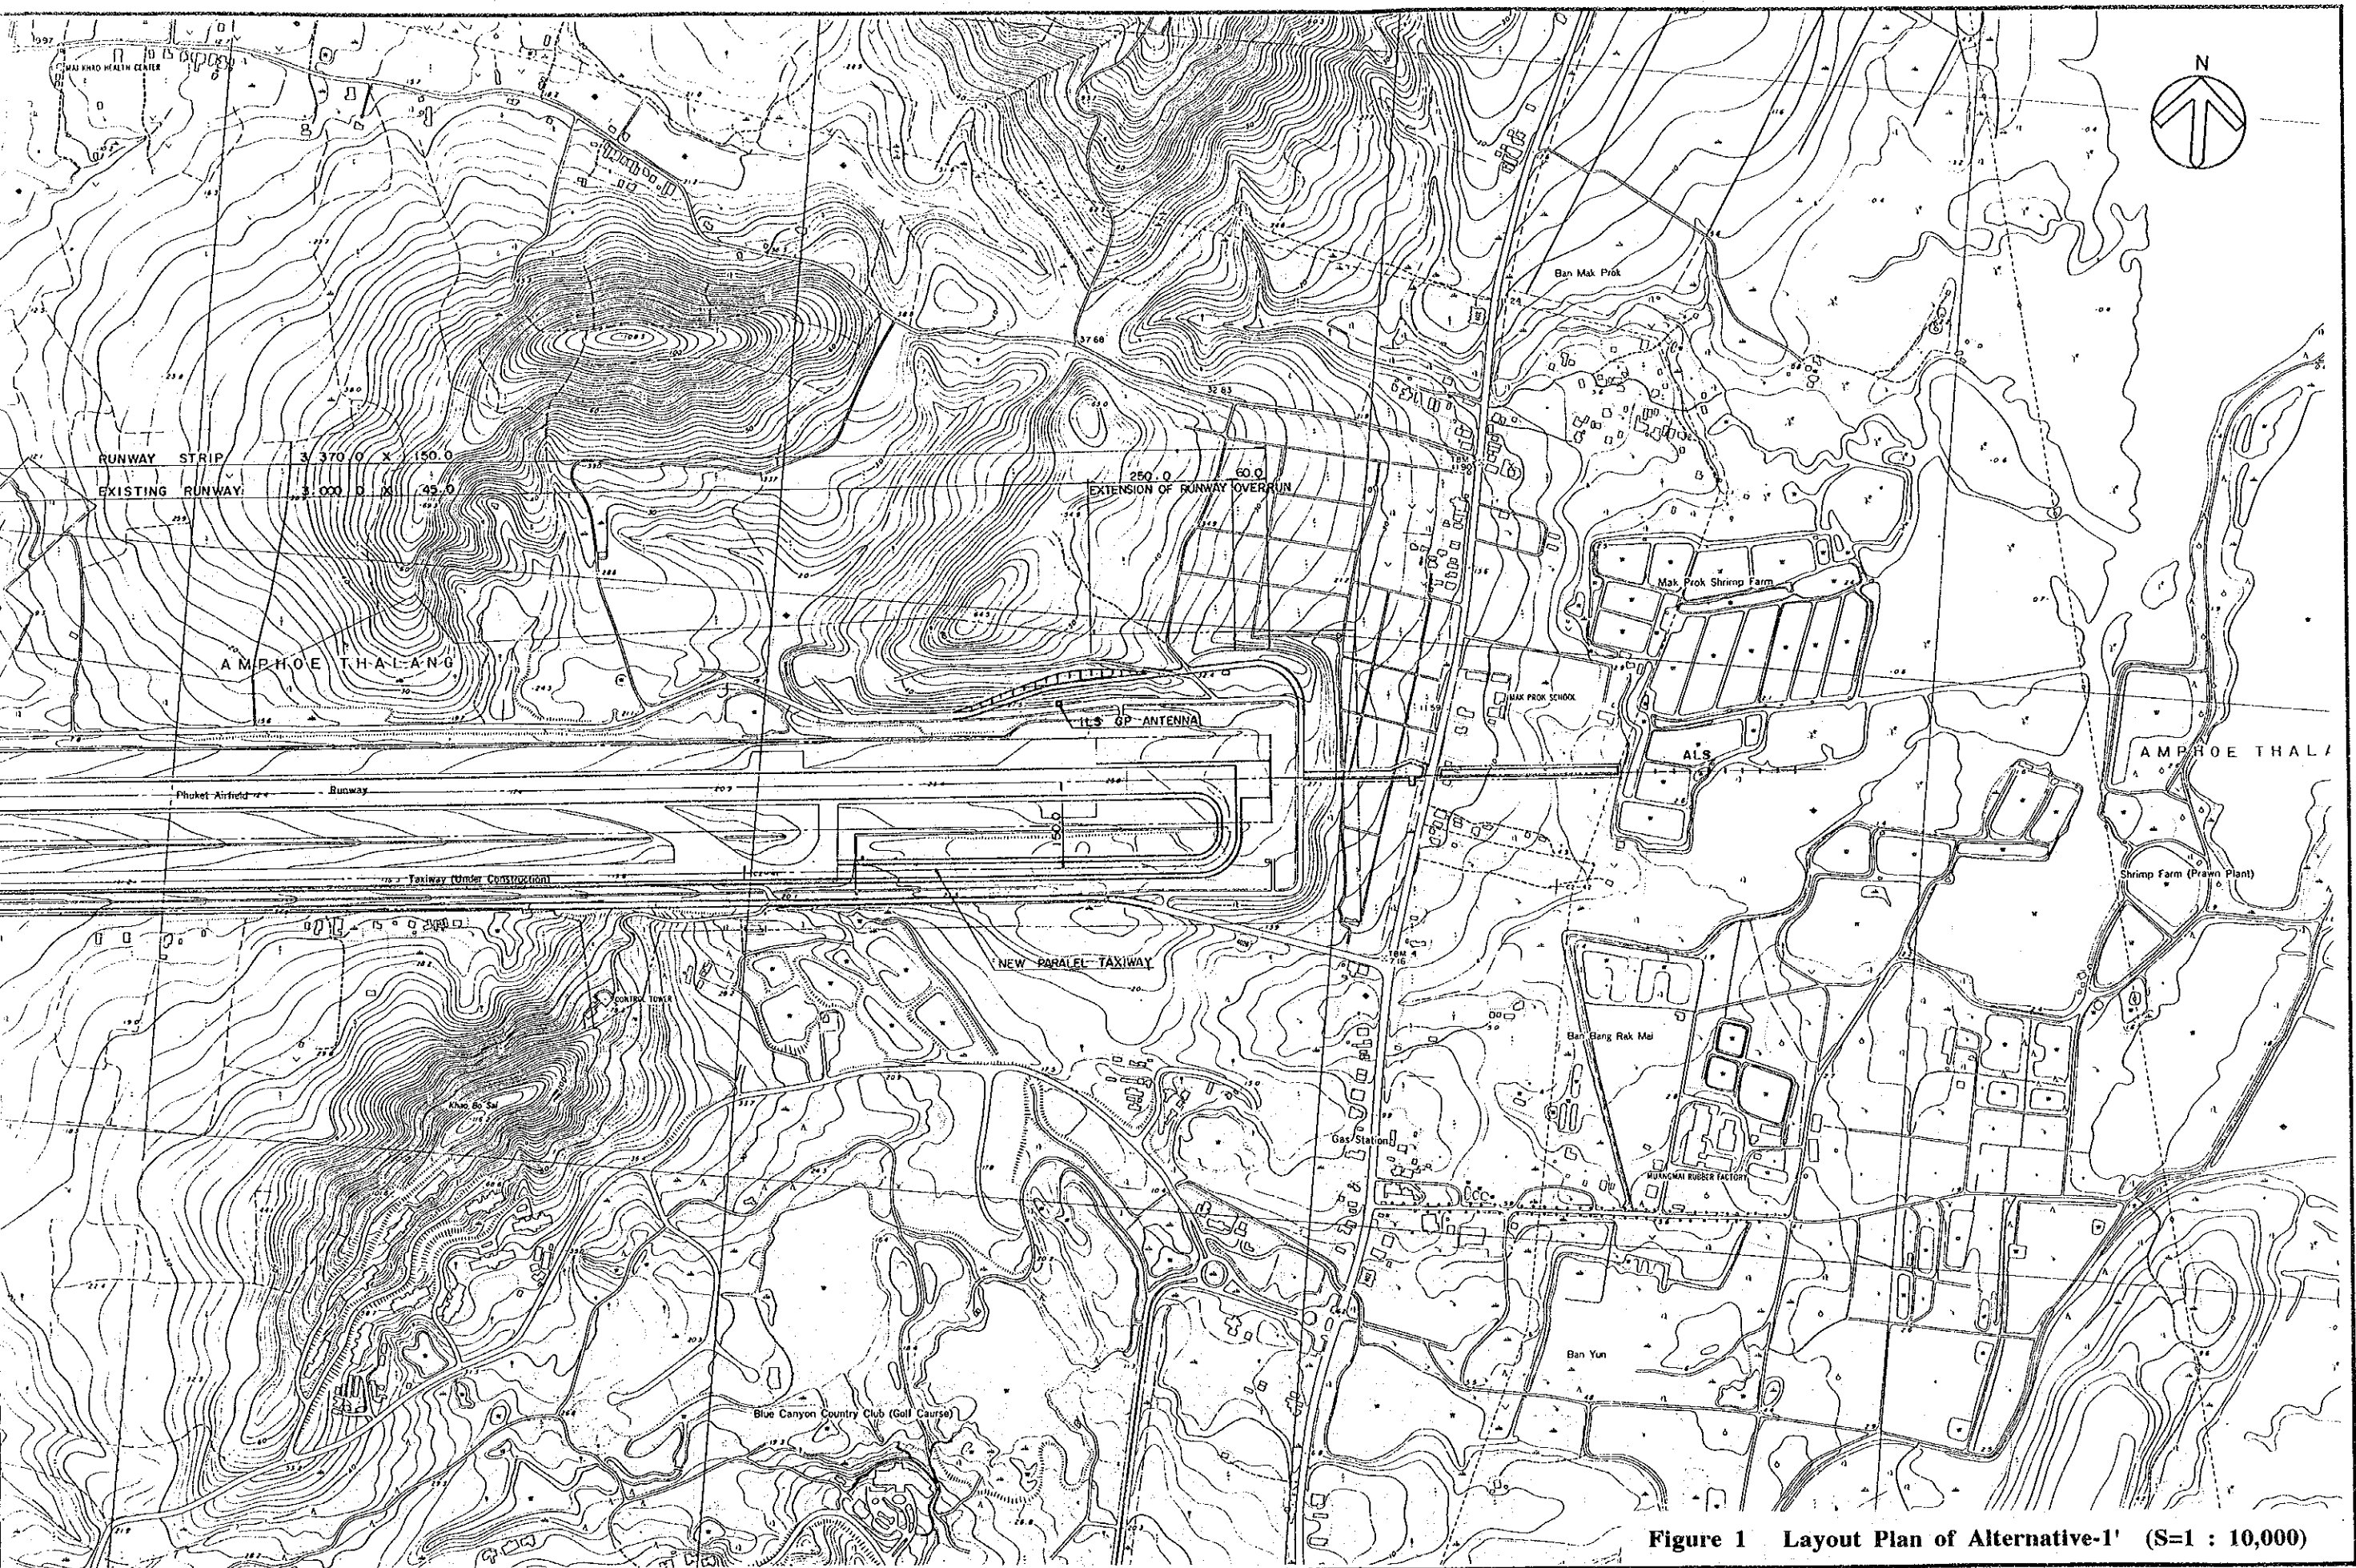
Layout Plan of Alternative-1' (S=1 : 10,000)
